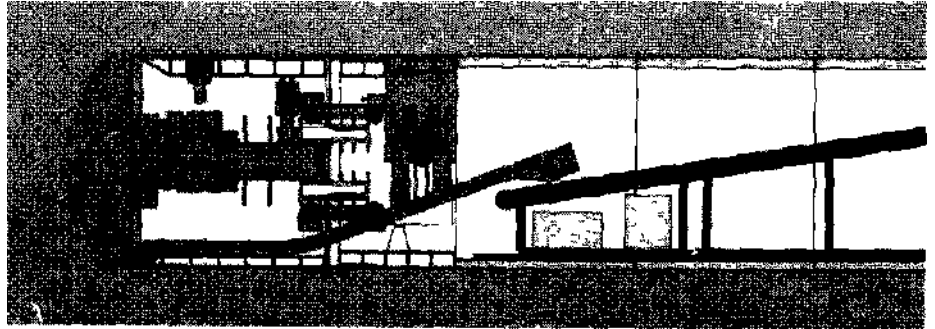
Break through of full face boring machine TS 3/04 after completion of tunnel at Nuremberg;.
